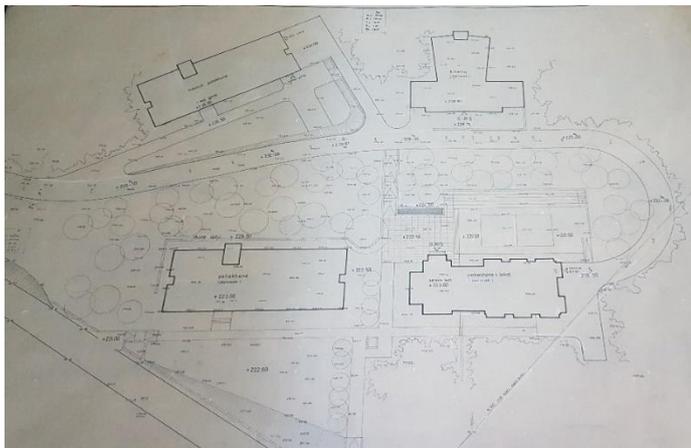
The site plan of the complex for workers (Source: TTK Archive, 2020)
